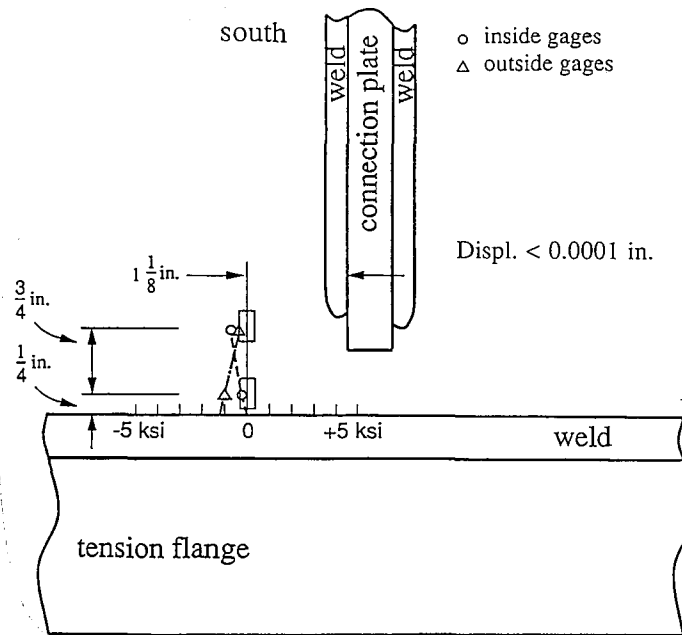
Static Stress Distribution for Outside Girder at Pier S5-2 Floorbeam Three with Lowboy in Outside Lane
